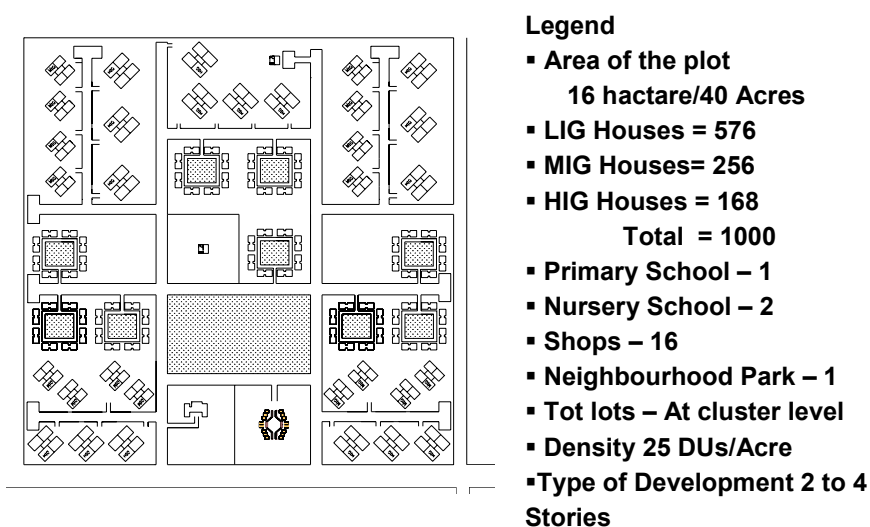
Settlement layout plan for a neighborhood of 5,000 population, Alternative – II
